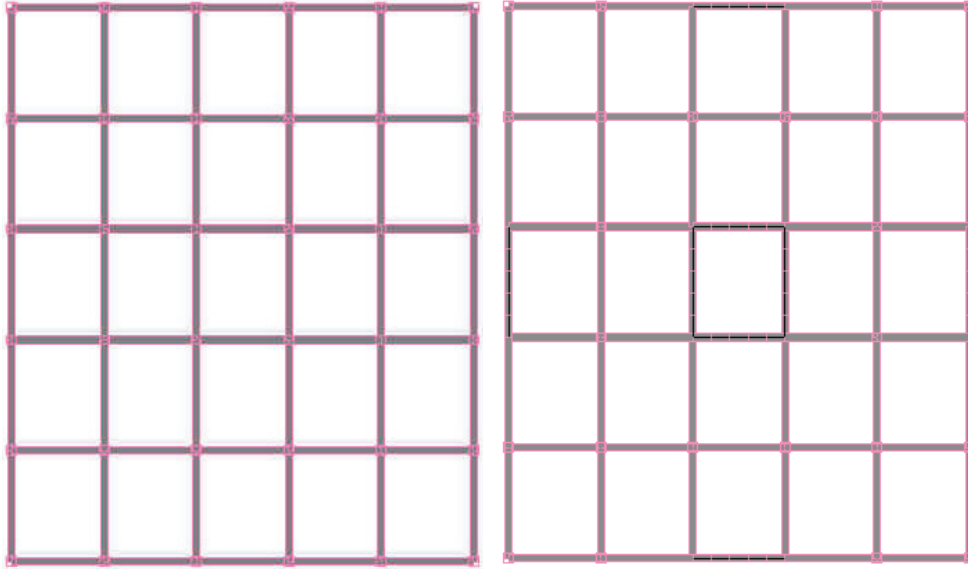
architectural plan of related models to F-SW-C systems and for 10 storey.
